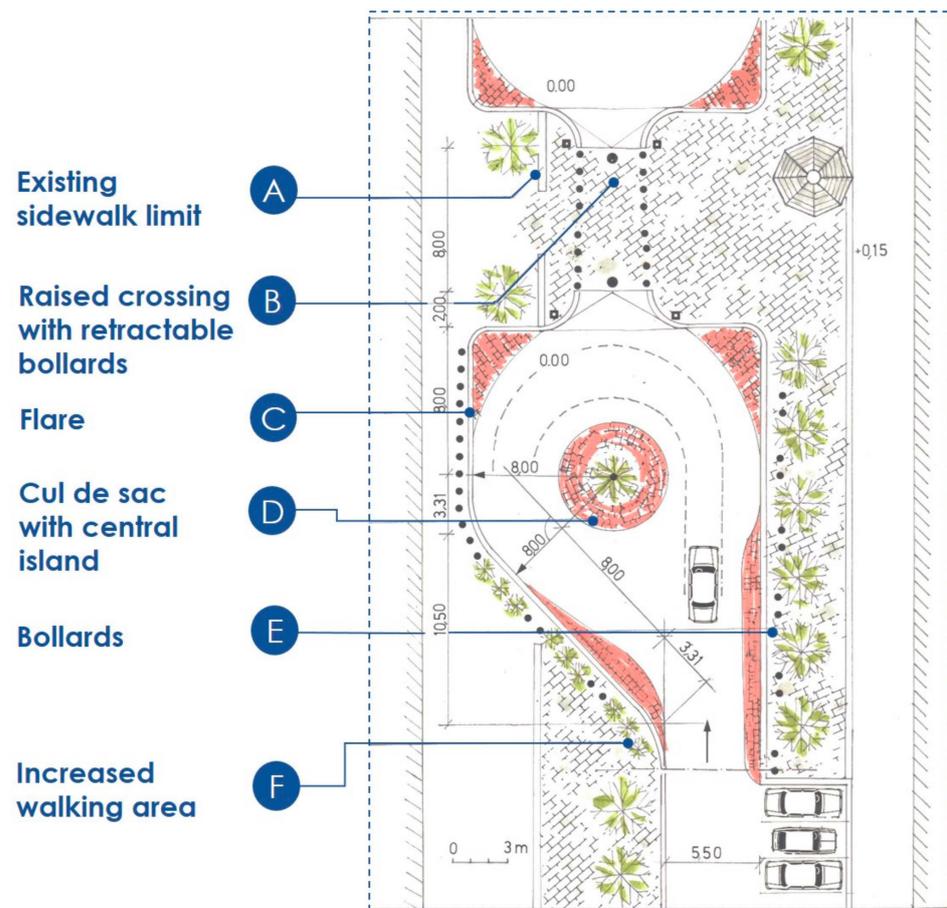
Road closure with cul-de-sac and mini roundabout (units in m).
